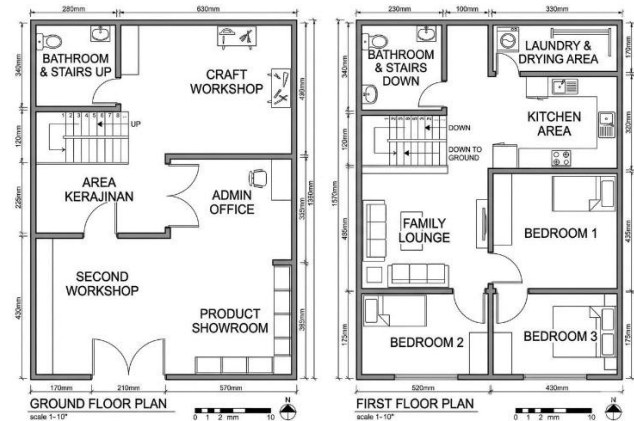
Floor plans of the ground floor (left) and upper floor (right) of Respondent B's existing house
